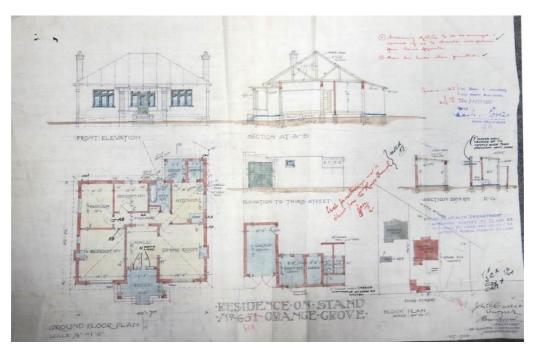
Plan for proposed new houses on Stand 659, Orange Grove from 1924 Good example of three bedroomed single storey residence with corrugated iron roofing and centrally located front stoep
